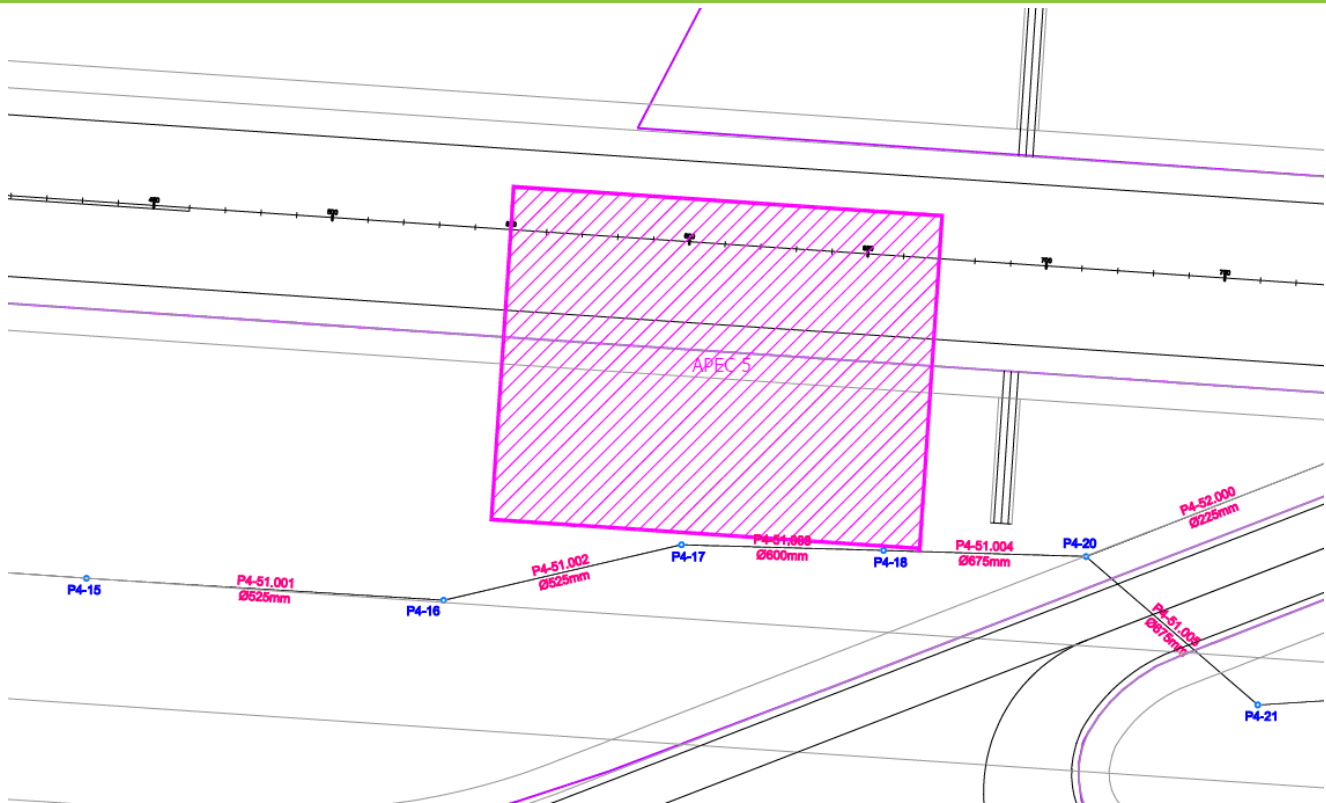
APEC 5 Location Green Surface Water Drainage System P4
